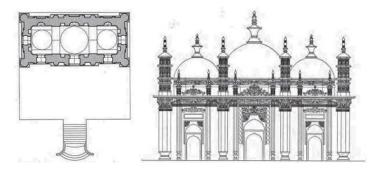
Shows, Rectangular Plan and Elevation of Mia Bari Mosque at Karapur, Barishal that shows 03
